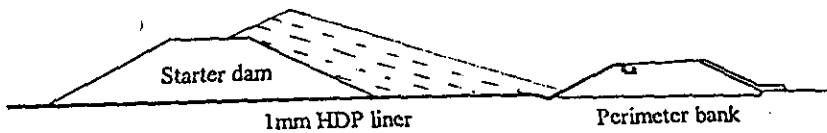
Section of perimeter bank and starter dam showing position of the HDP sheet liner.
